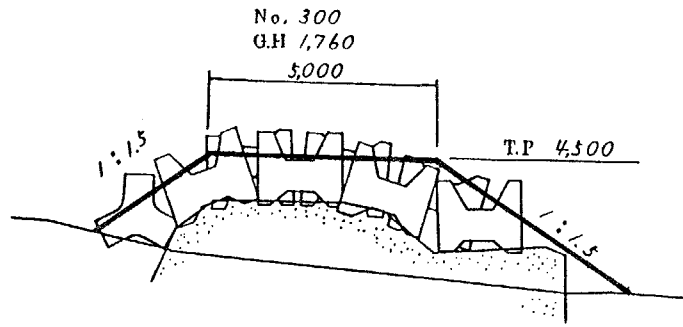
The Cross Section of Sand Dike Protection of 4-ton Hexapods at Minehama.
